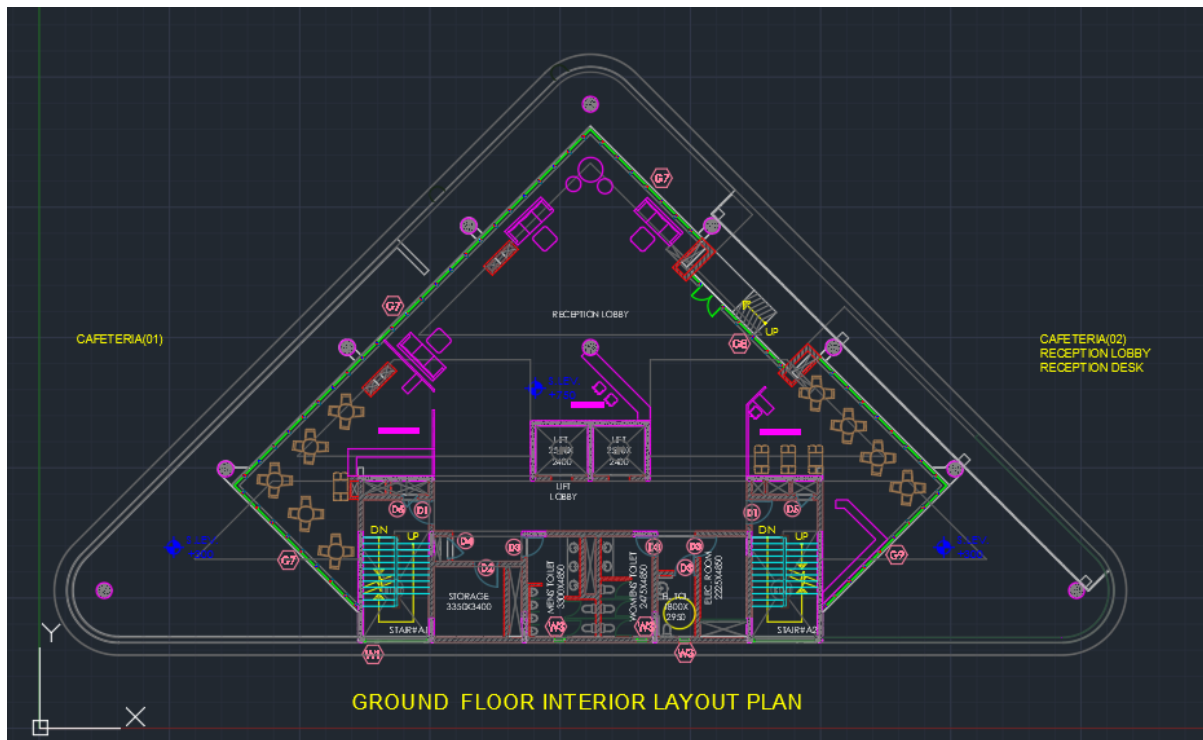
AutoCAD layout for Ground Floor of GRIDCO Building
